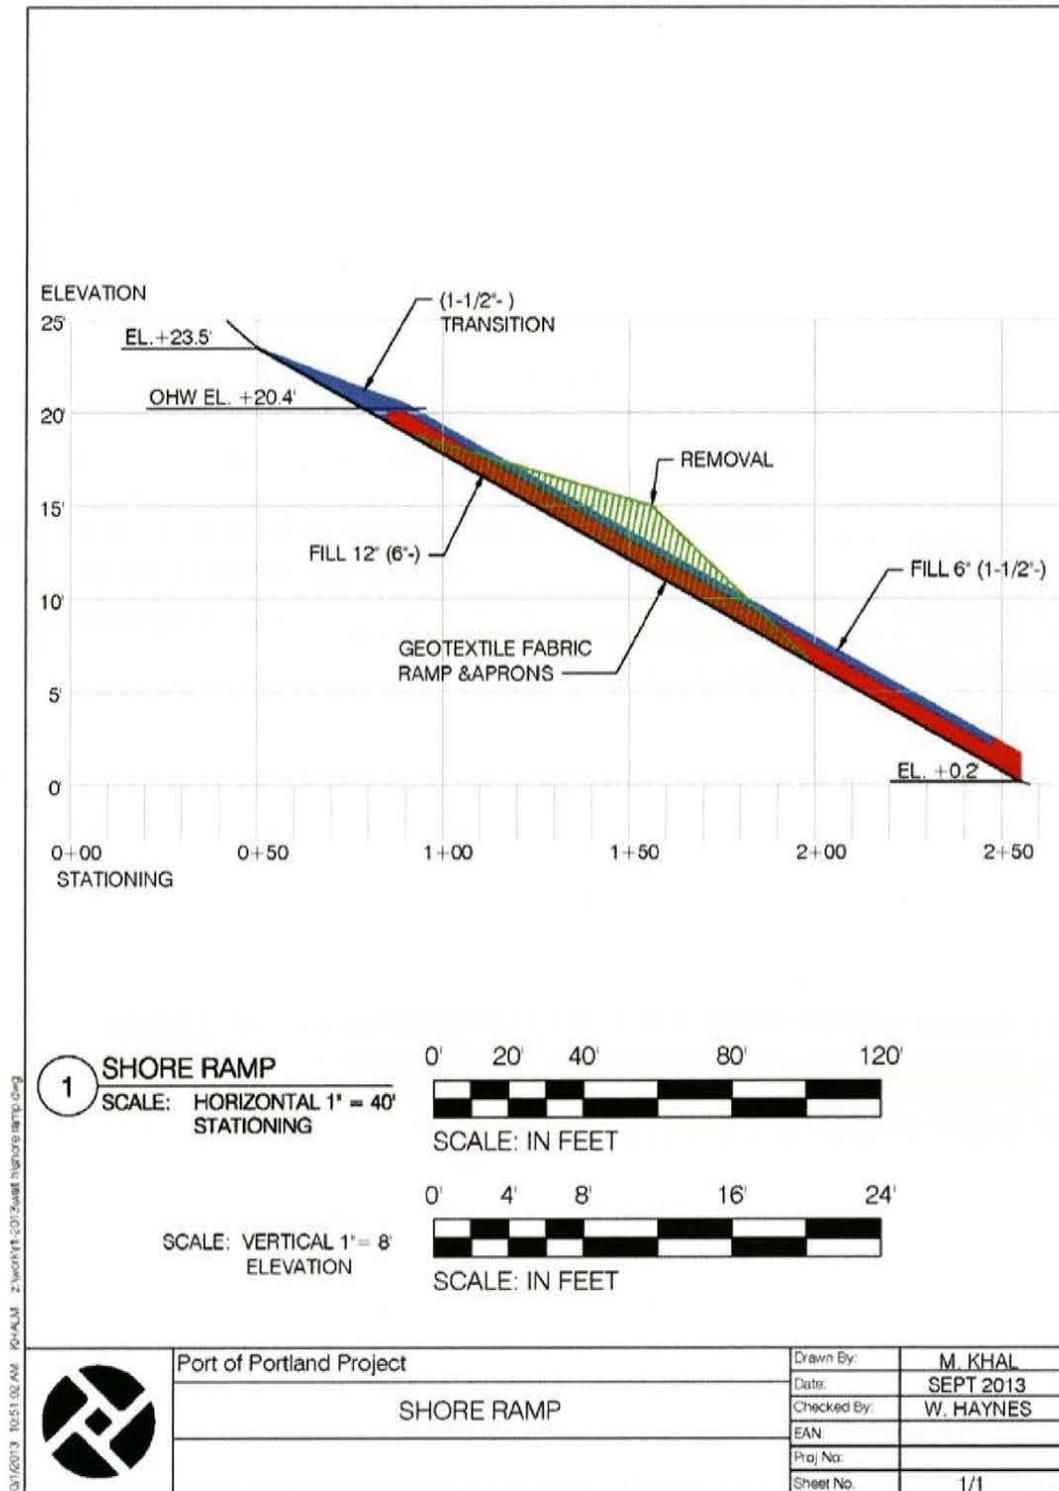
Cross-section drawing of the proposed Port Navigation Shore Ramp Project.
